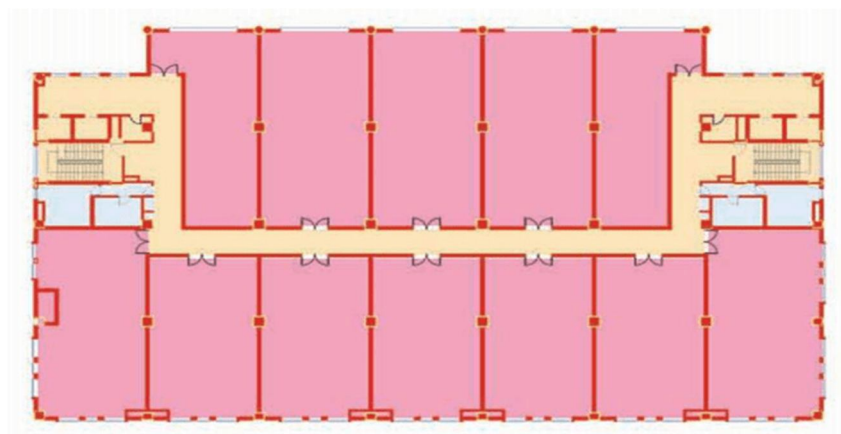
Floor Plan of Shalimar Titanium (Source: Shalimar co.in)
